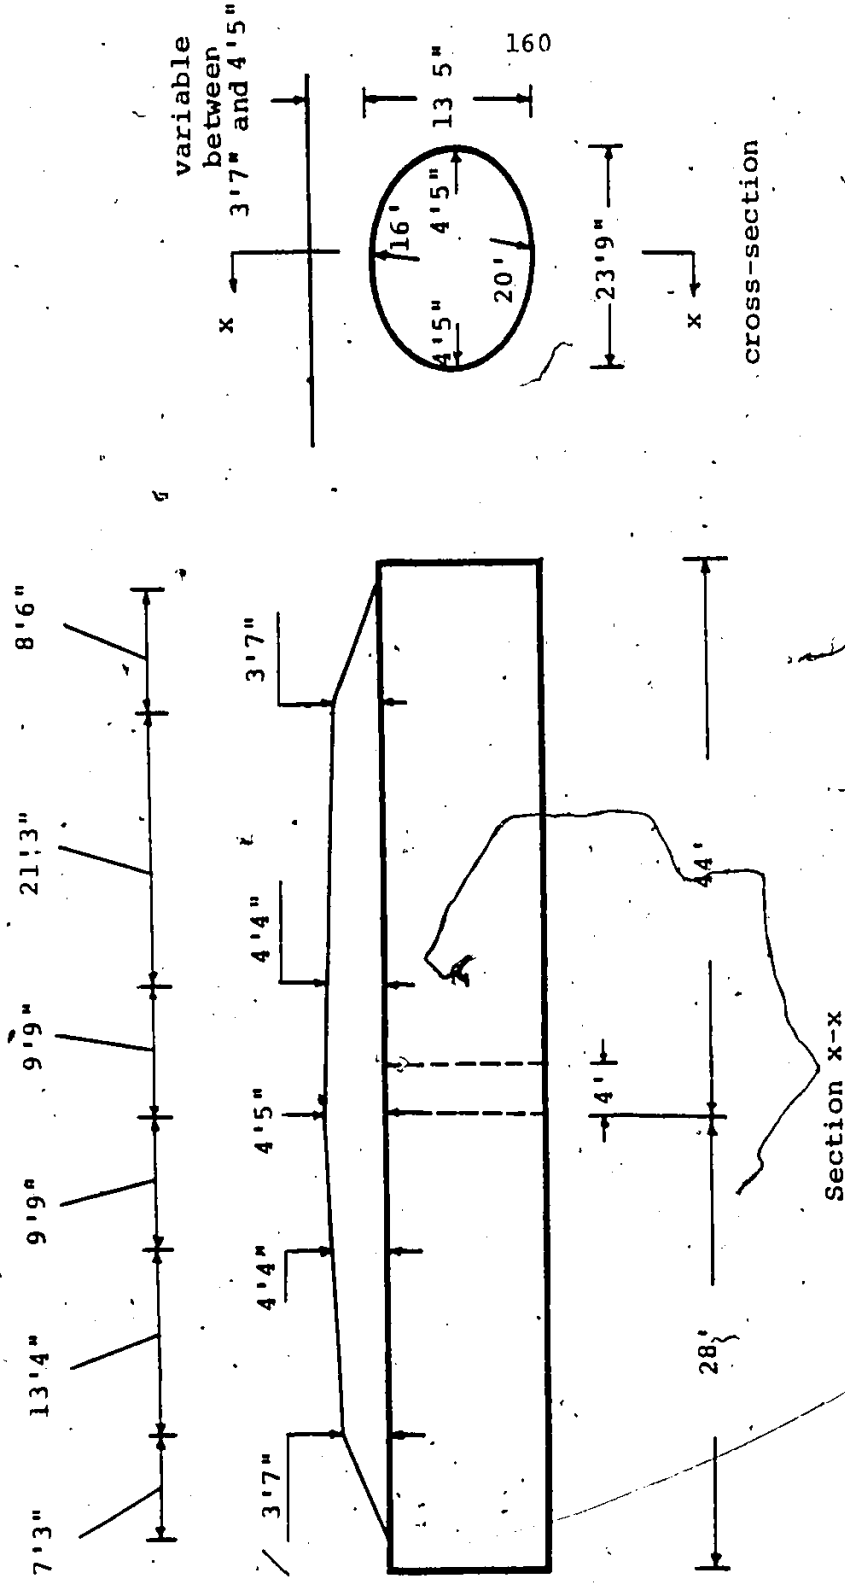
Details of Adelaide Creek soil-steel structure.
